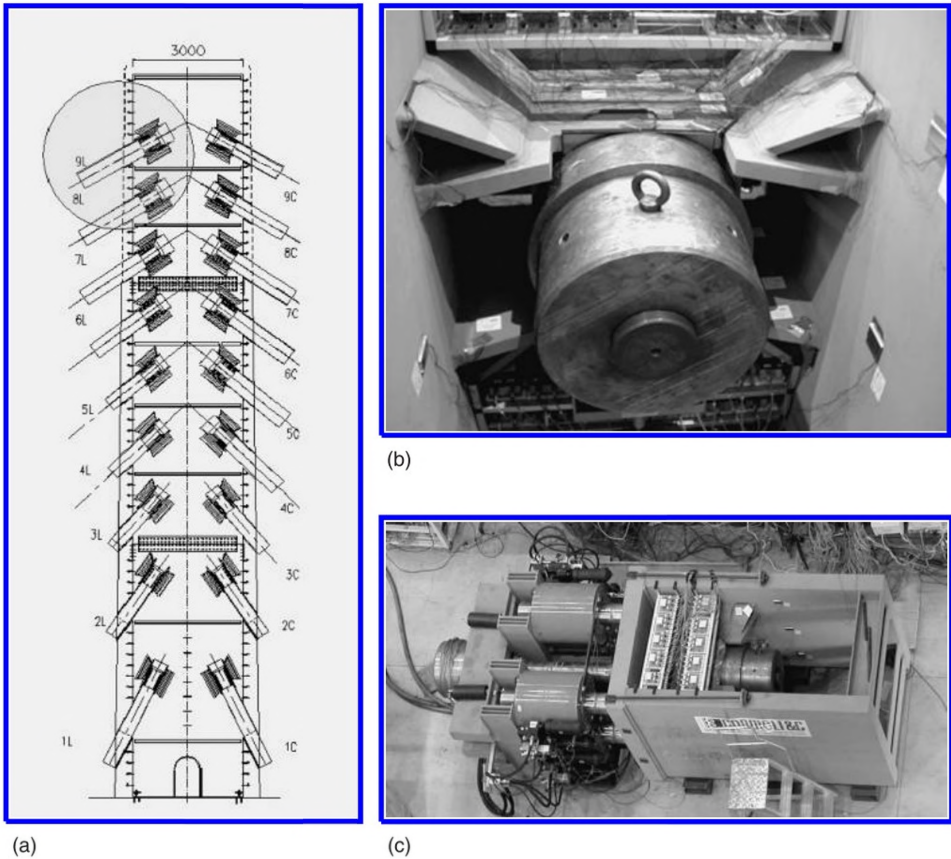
(a-c). Section of the top of the tower and two images of the full scale model of an anchorage.
